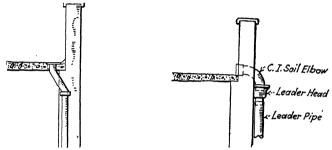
Conductor pipe inside wall. Fig. 170.—Leader outside wall.
